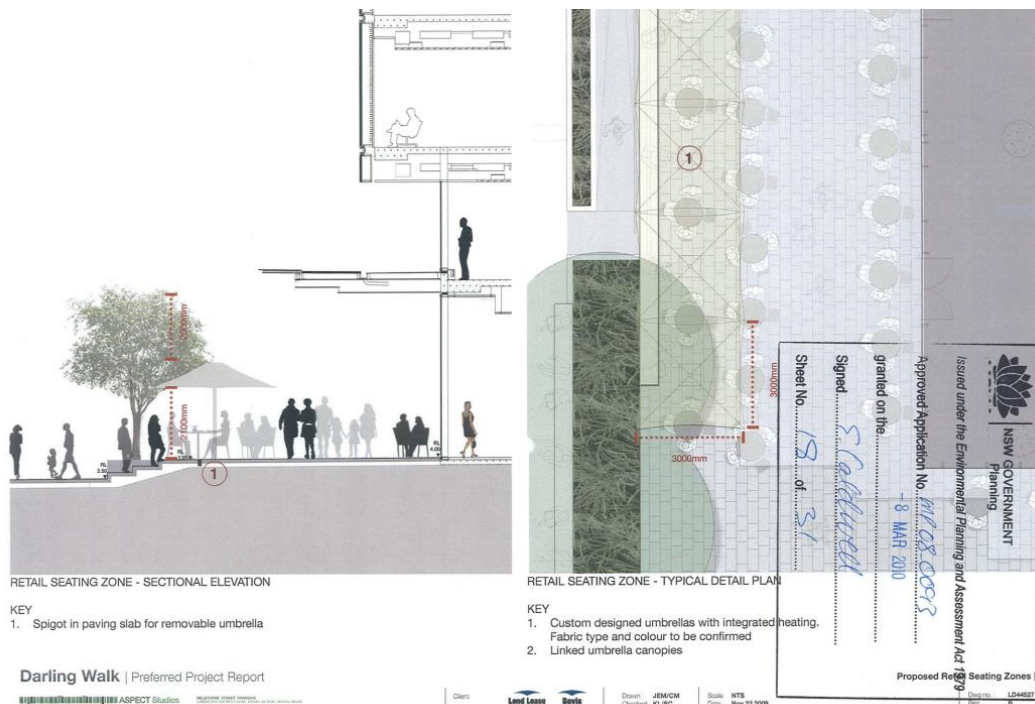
Stamped approved western retail seating zone sectional elevation and typical detail plan (MP08_0093)
